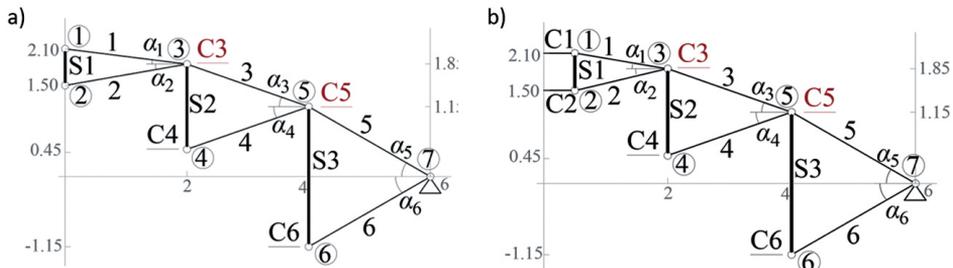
Load-bearing girders of Geiger dome: a) type A, b) type B
